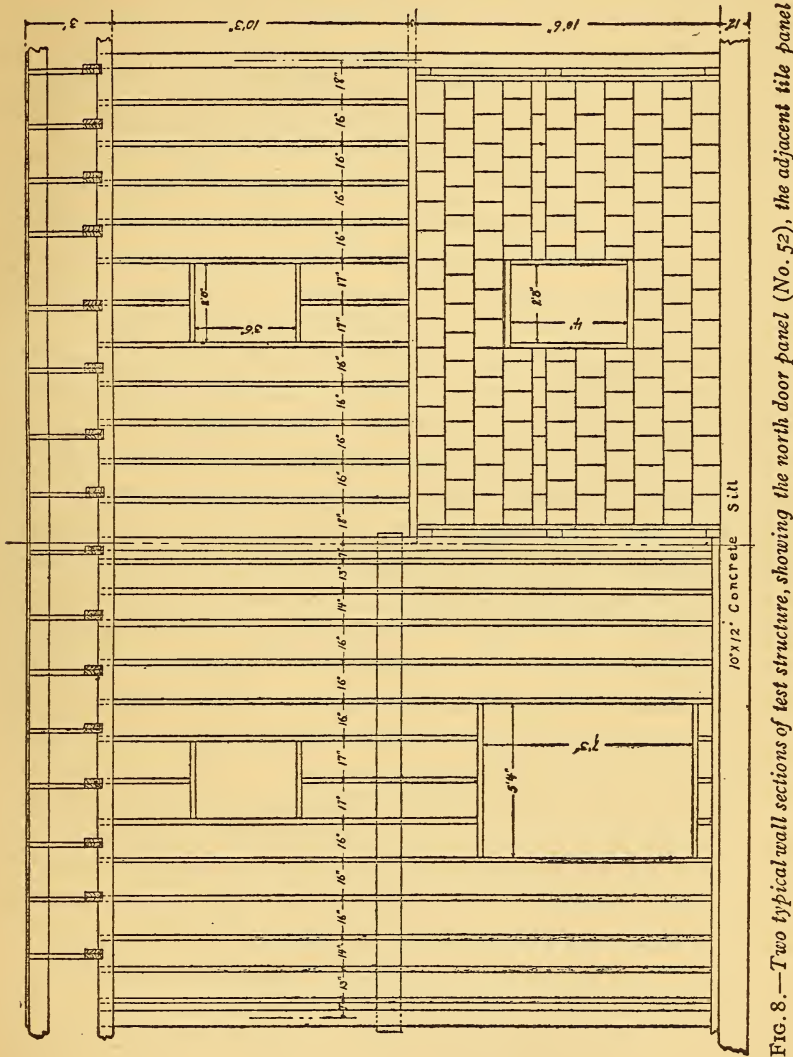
Two typical wall sections of test structure, showing the north door panel (No. 52), the adjacent tile panel (No. 33), and the two second-story frame panels (Nos. 9 and 10)
